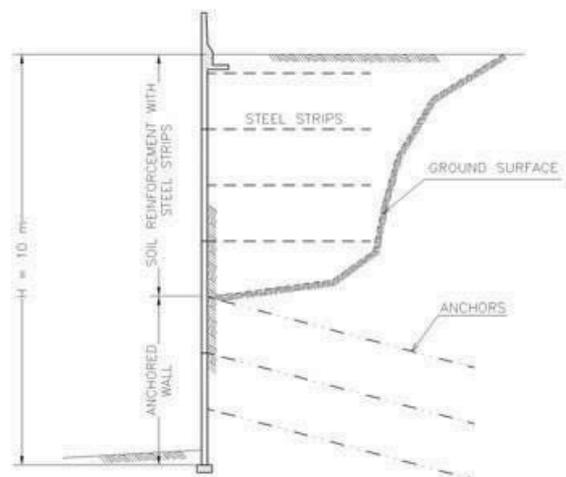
Typical cross-section of mixed reinforced fill-anchored wall.
